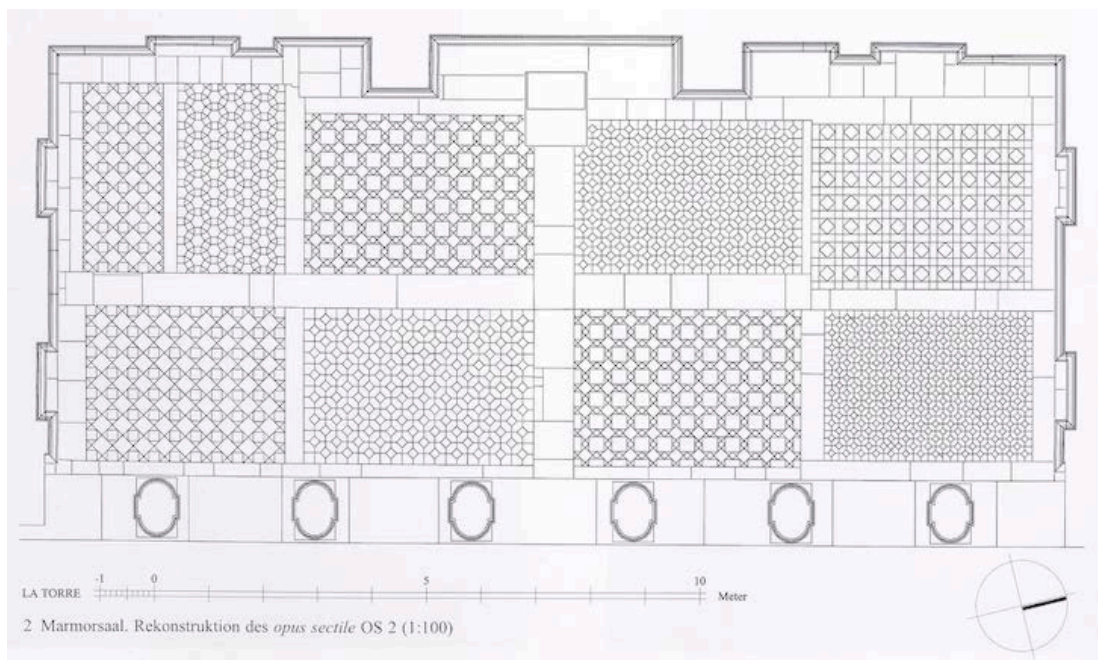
Marble Hall. Reconstruction of the *opus sectile* floor (OS 2) (1:100).
